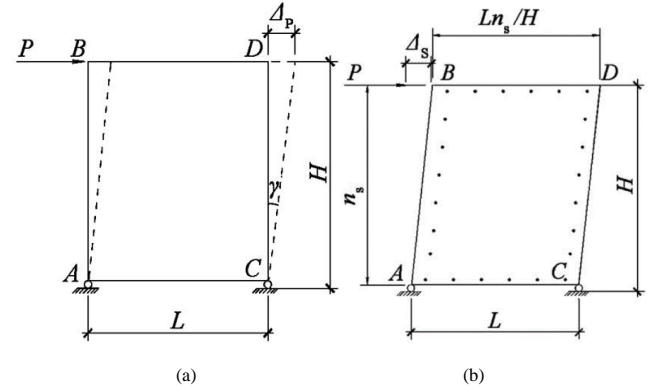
Shear deformation. (a) Shear deformation of wall panel. (b) Shear deformation caused by screws slip of wall panel
